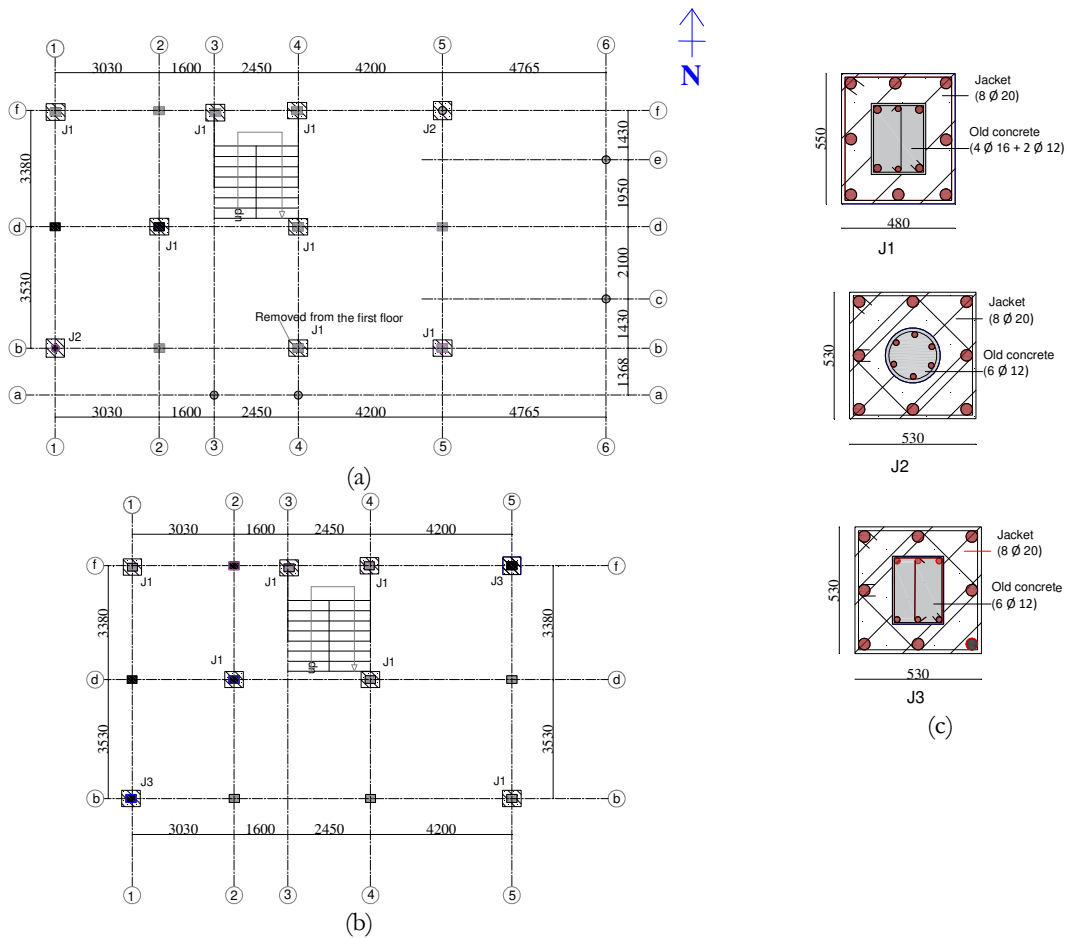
Jacketing layout and section details in the MRT1-WO-GI building; (a) Ground and first floors, (b) Second floor and (c) Section and reinforcement details (all dimensions are in mm)
